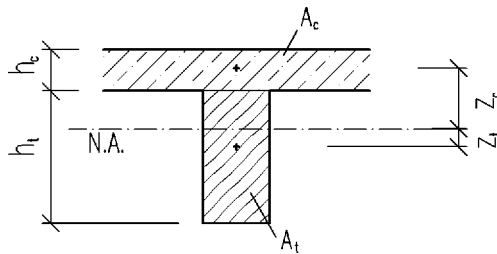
Eccentricities and cross-sectional areas of the concrete slab and timber beam
